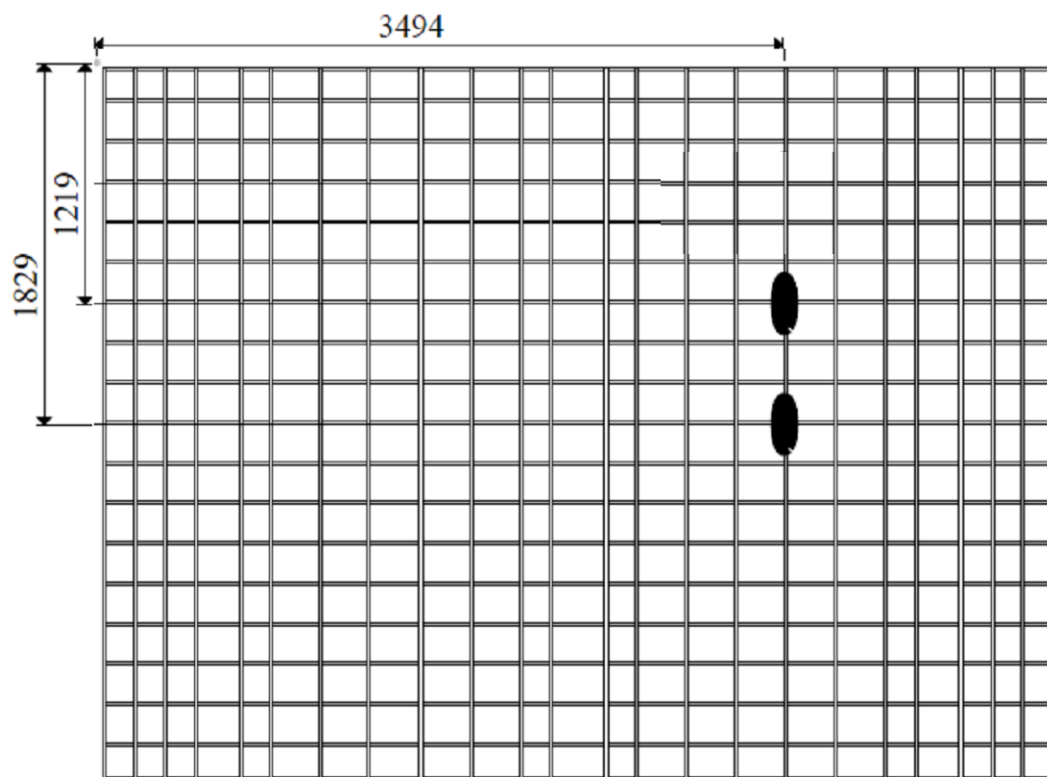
Layout of strain gages attached to top longitudinal steel reinforcement (same layout of strain gages attached to the bottom longitudinal reinforcement)
